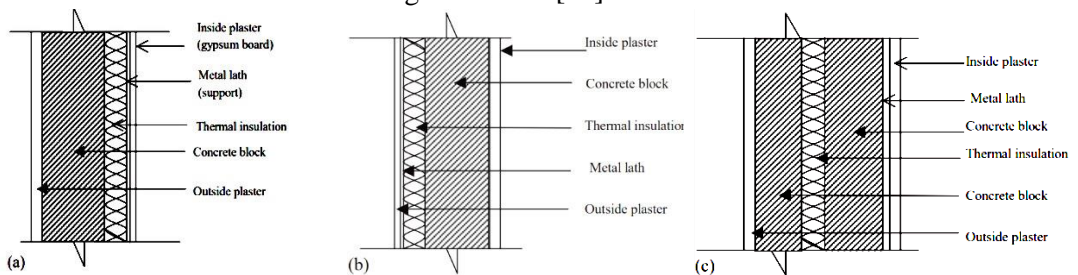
Methods for placing wall insulation. (a) the placement of insulation inside mass, (b) the placement of insulation outside mass, (c) the placement of insulation in the middle.
